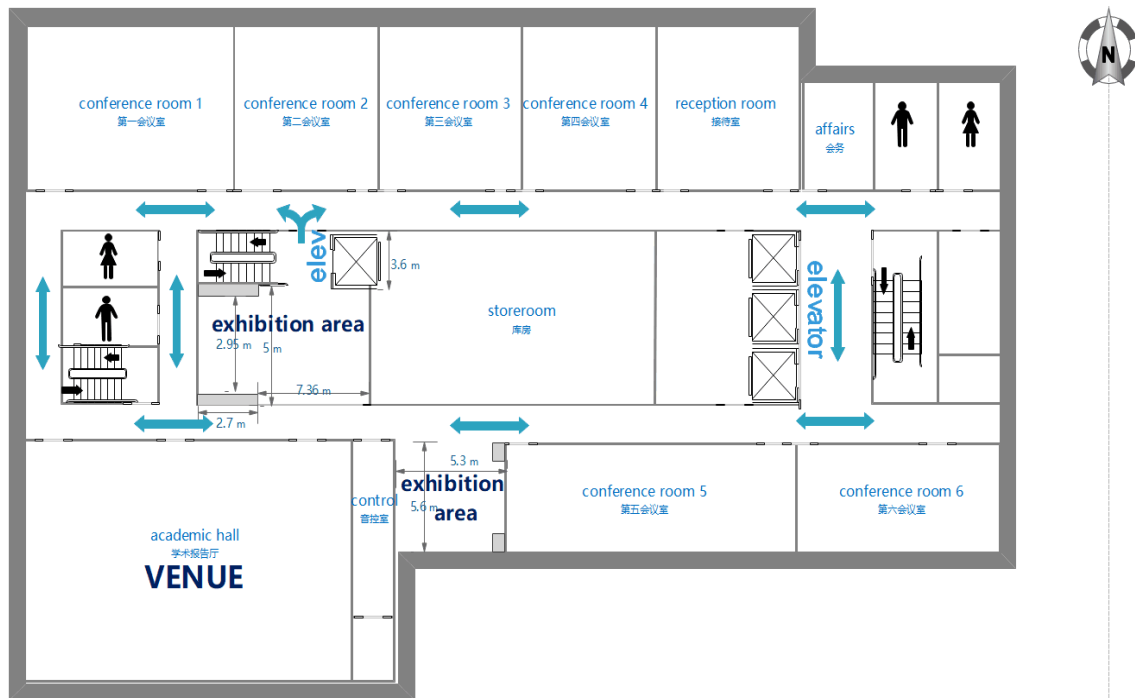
The plan of the third floor of Intelligence Building of CASIA
